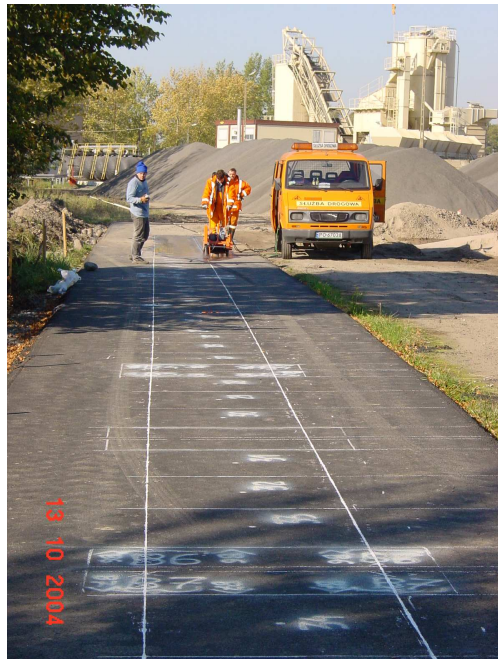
The strip of 1m width in the middle part of the test pavement cross-section, designed for sampling
